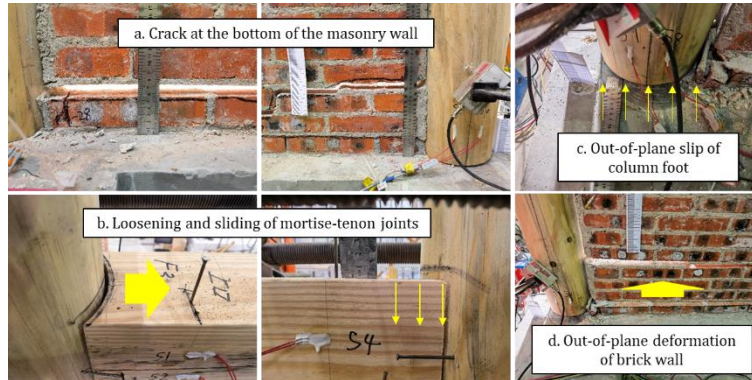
Experimental phenomena of the wall with dry shrinkage in joints (specimen F3)
